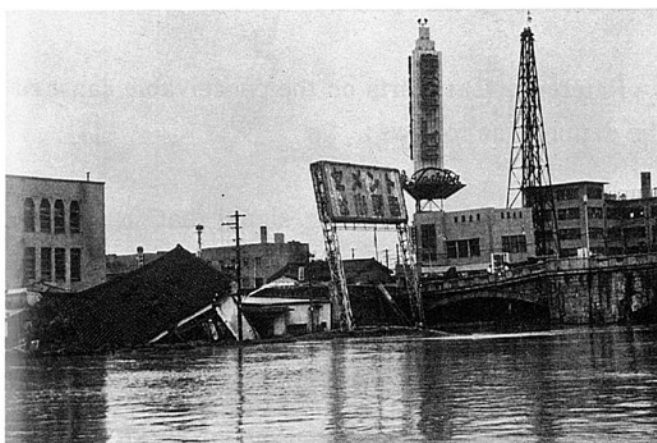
Displacement of a building toward the river on the left bank near Bandai Bridge
